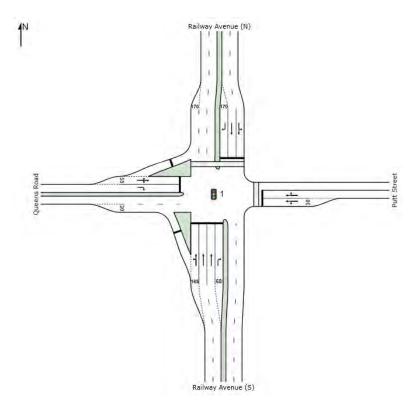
Proposed improvements at Railway Avenue, Queens Road and Putt Street for year 2033 base traffic
